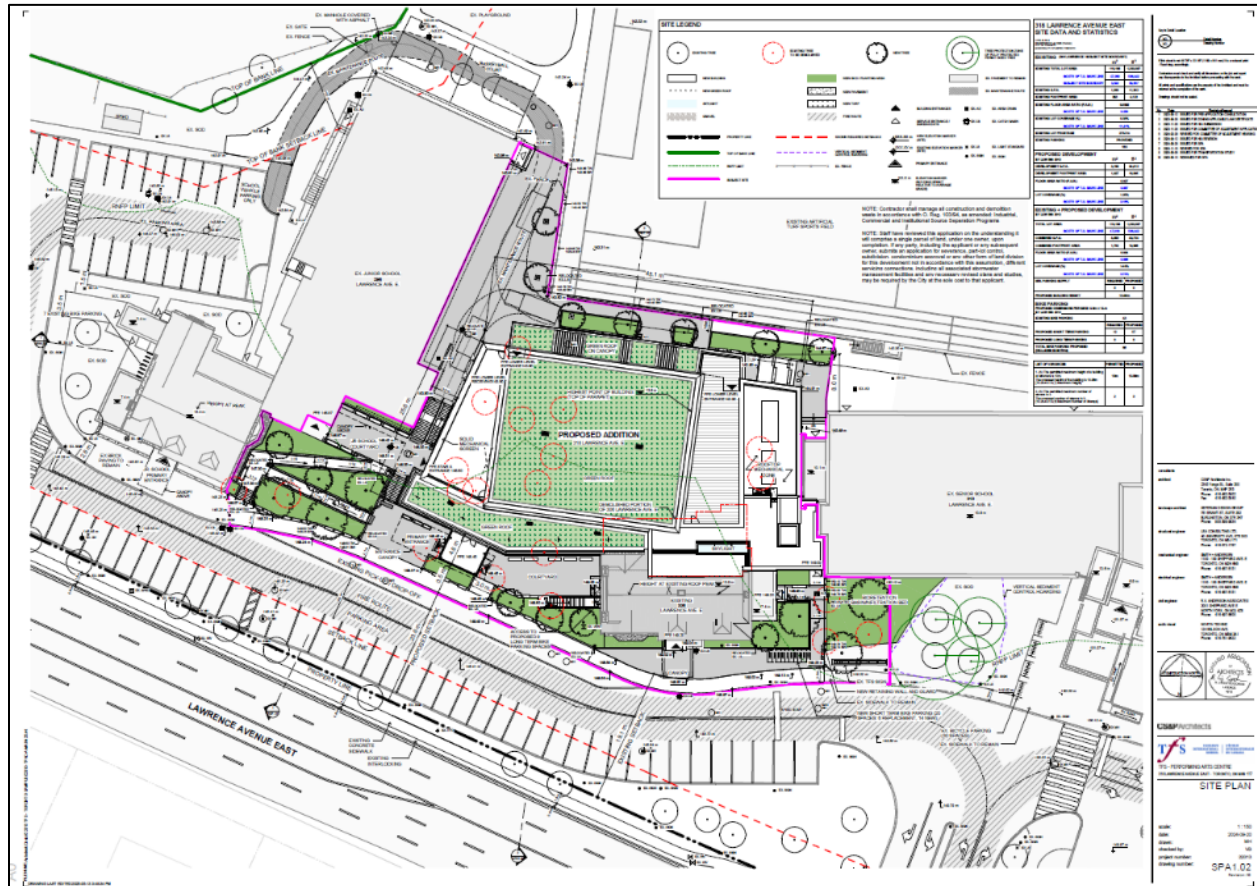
Site Plan with proposed new addition (CS+P Architects, May 13, 2025).
